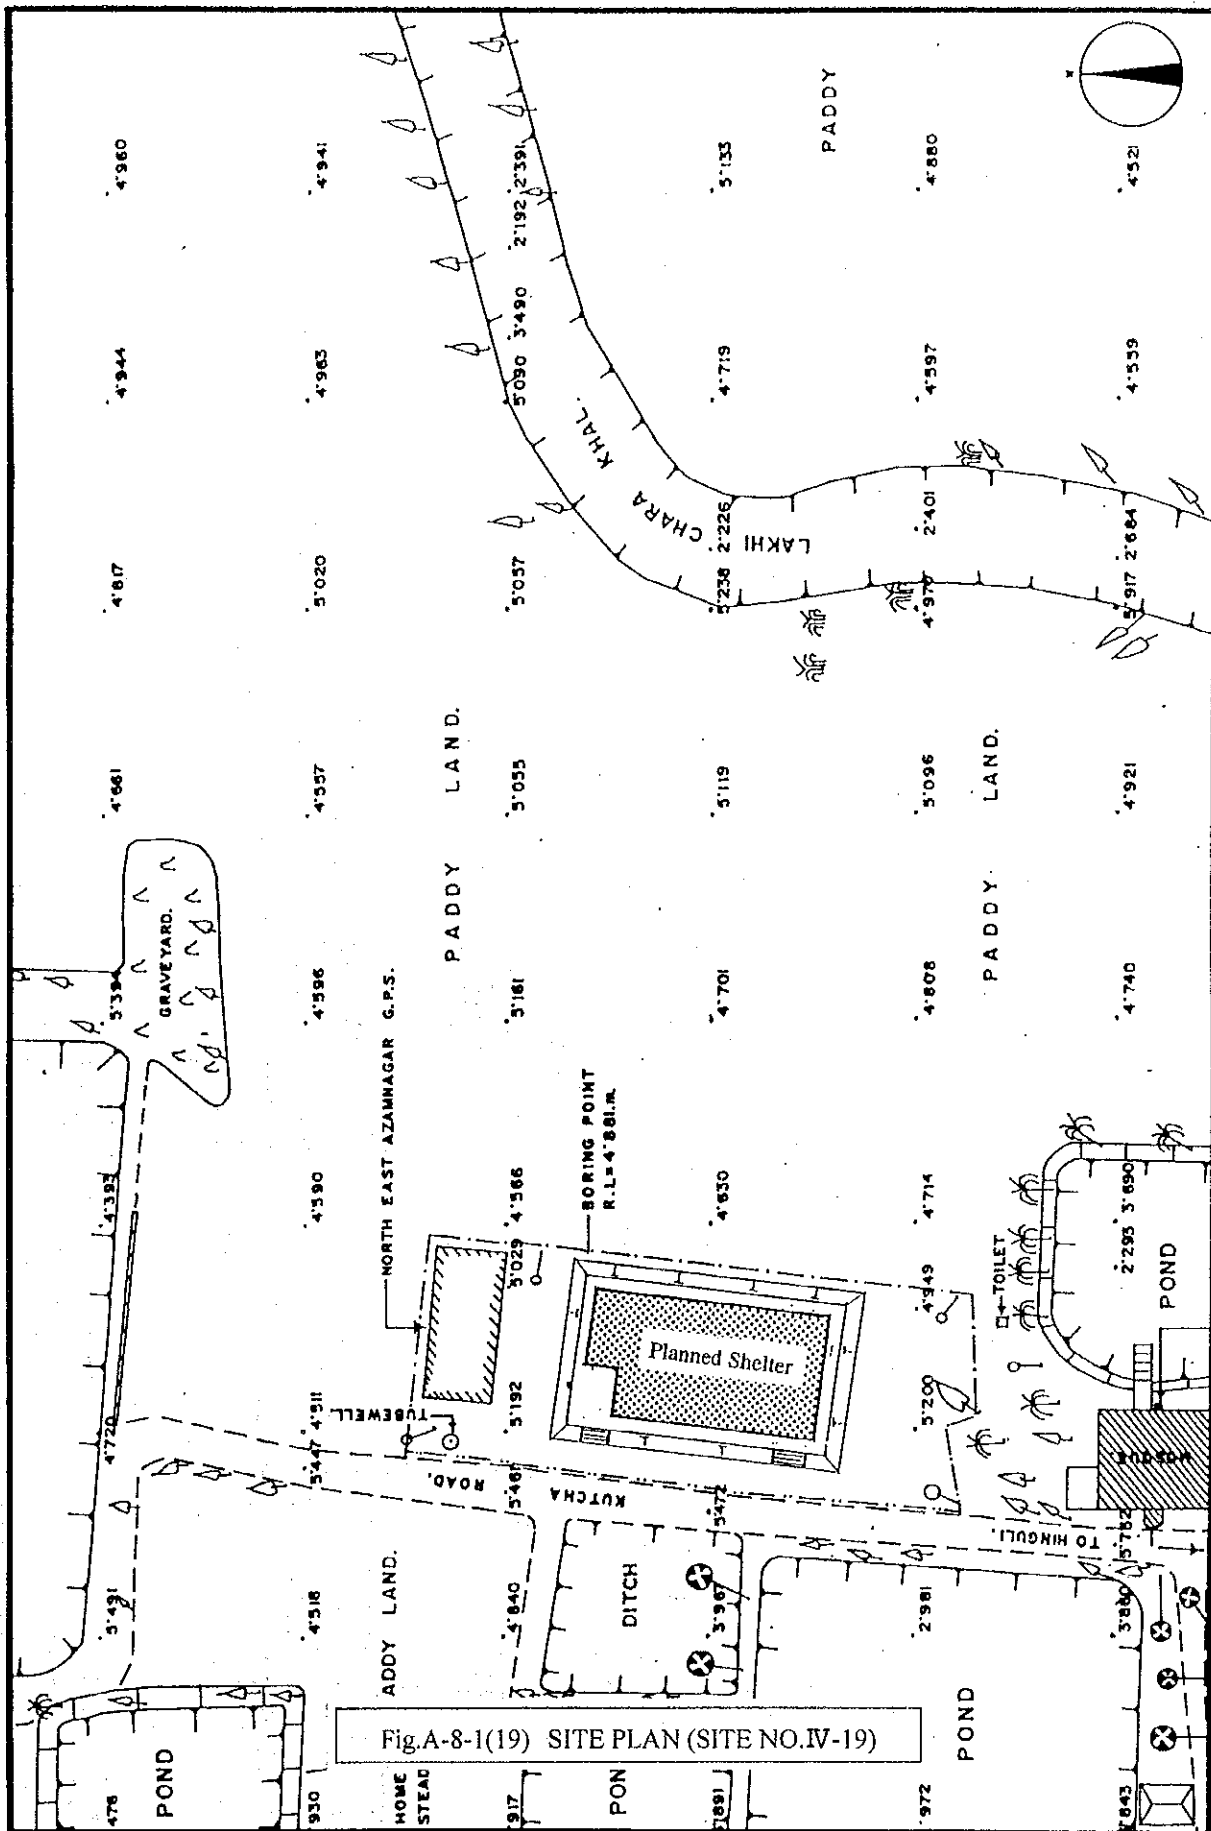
(19) SITE PLAN (SITE NO.IV-19)
